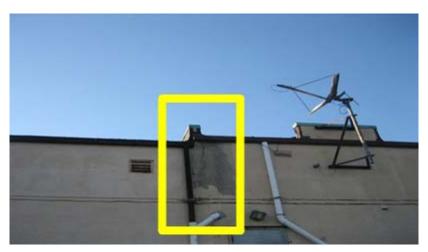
The Masonry Firewall that Extends above the Roofline Affords the Greatest Protection
